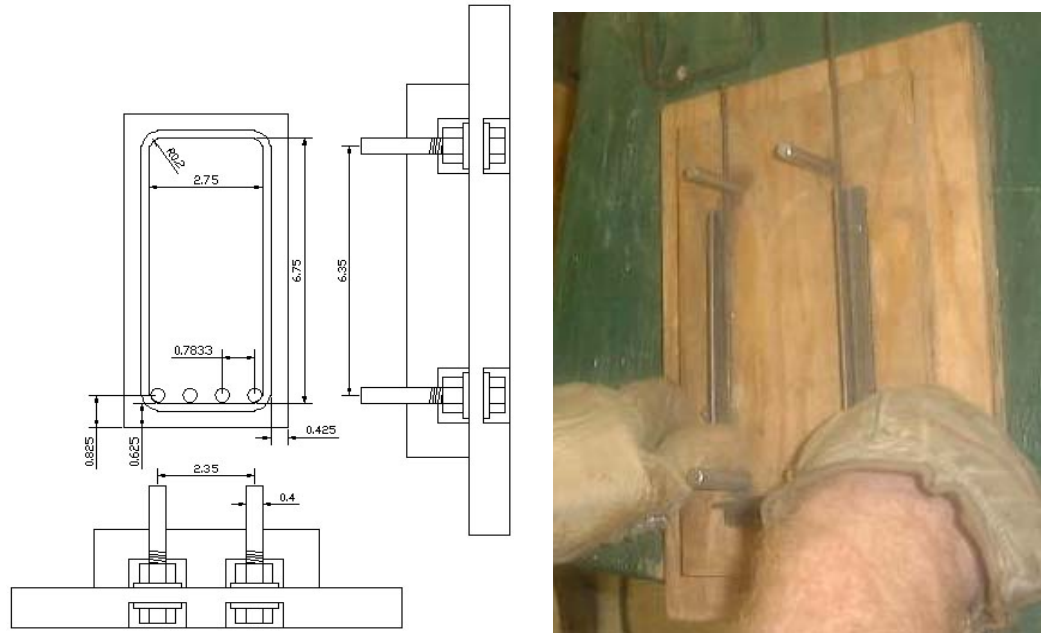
Jig Design and Bending of Steel Shear Reinforcement in Jig for Prototype Beams.
